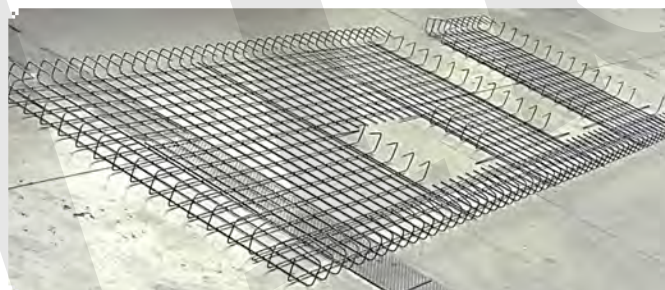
Reinforcing mesh prepared using robot with edge bent bars to suit reinforcement details.
